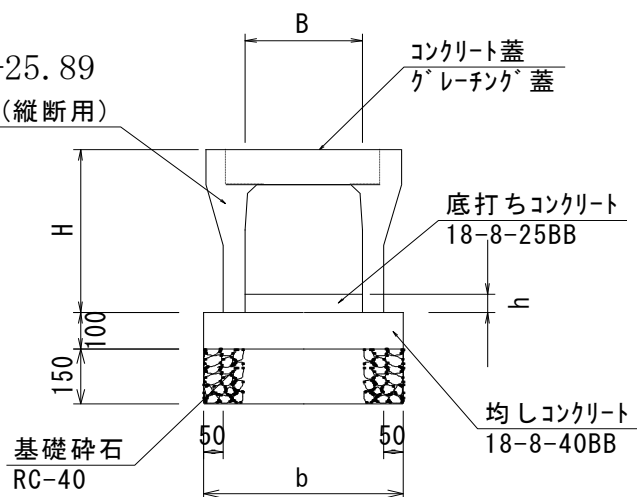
Cross-section diagram of a concrete pile foundation. The diagram shows a pile with a top width  $B$  and a base width  $b$ . The pile is embedded in a concrete cap (底打ちコンクリート) with a height  $h$ . The cap is reinforced with 18-8-25BB bars. The pile is surrounded by a concrete jacket (均しコンクリート) with a thickness of 50mm, reinforced with 18-8-40BB bars. The pile is made of RC-40 concrete. The total height of the pile is  $H$ . The diagram is labeled "自由勾配側溝(縦断用)".
